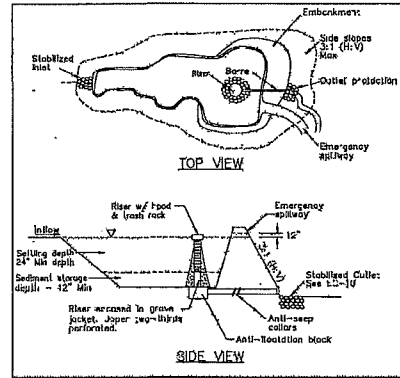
TYPICAL TEMPORARY SEDIMENT BASIN MULTIPLE CHECK DAM DESIGN NOT TO SCALE
